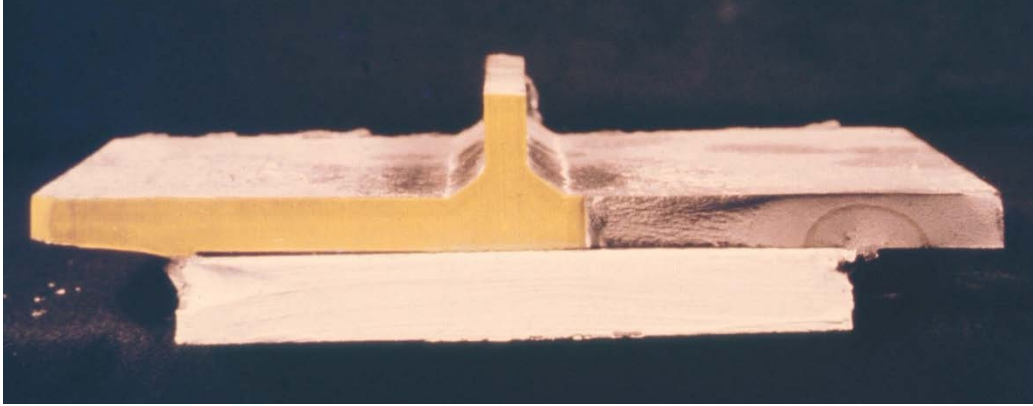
Crack at end of cover plate without an end weld.
